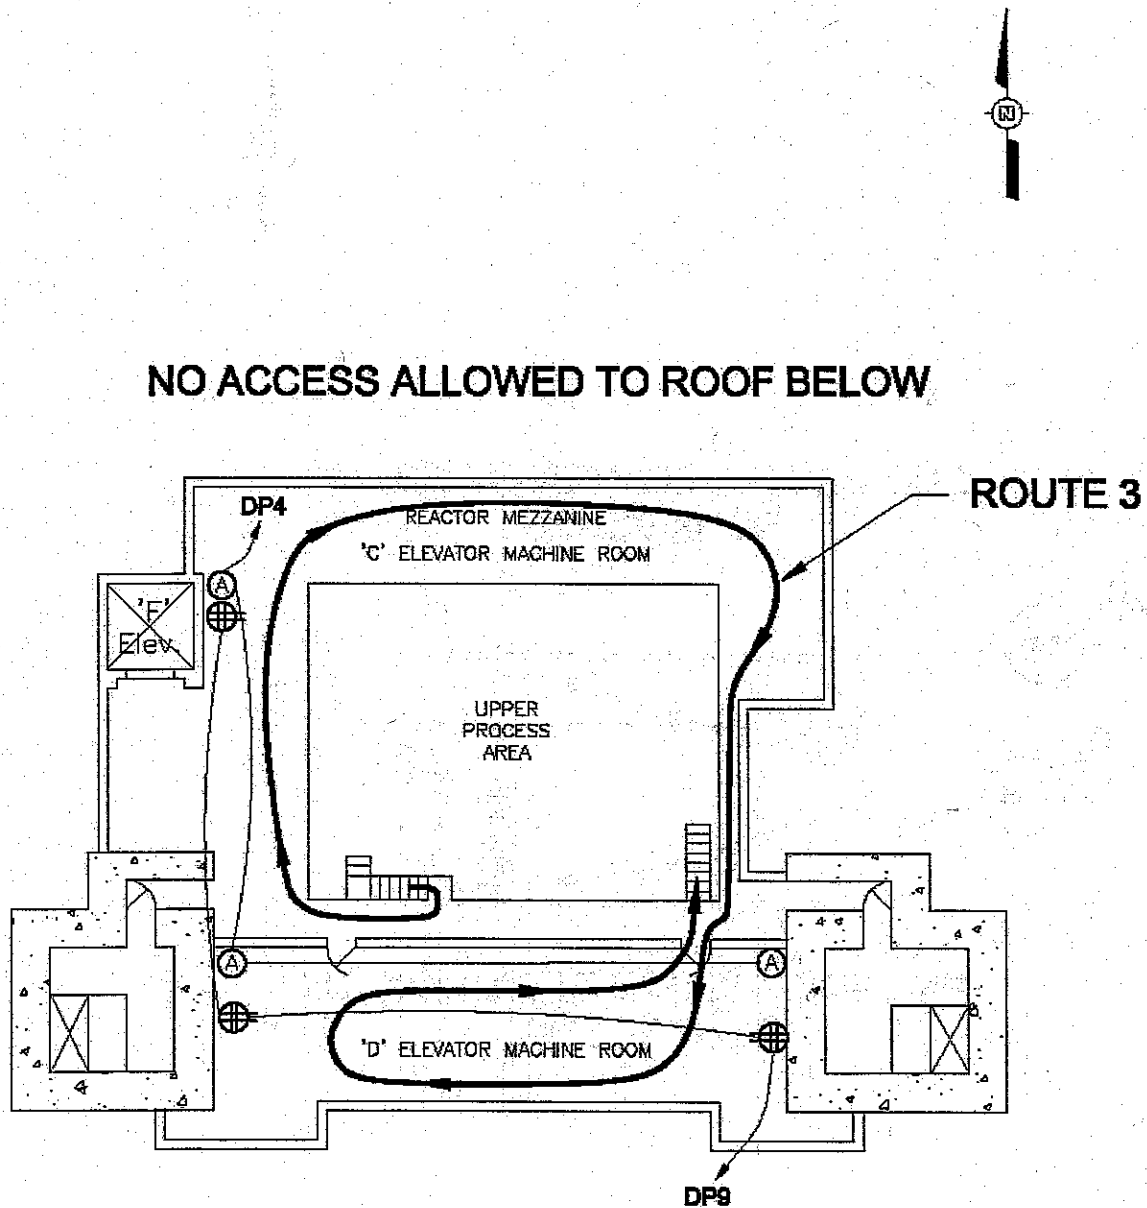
Surveillance and Inspection Route (Elevation 42 ft 5 in.).
